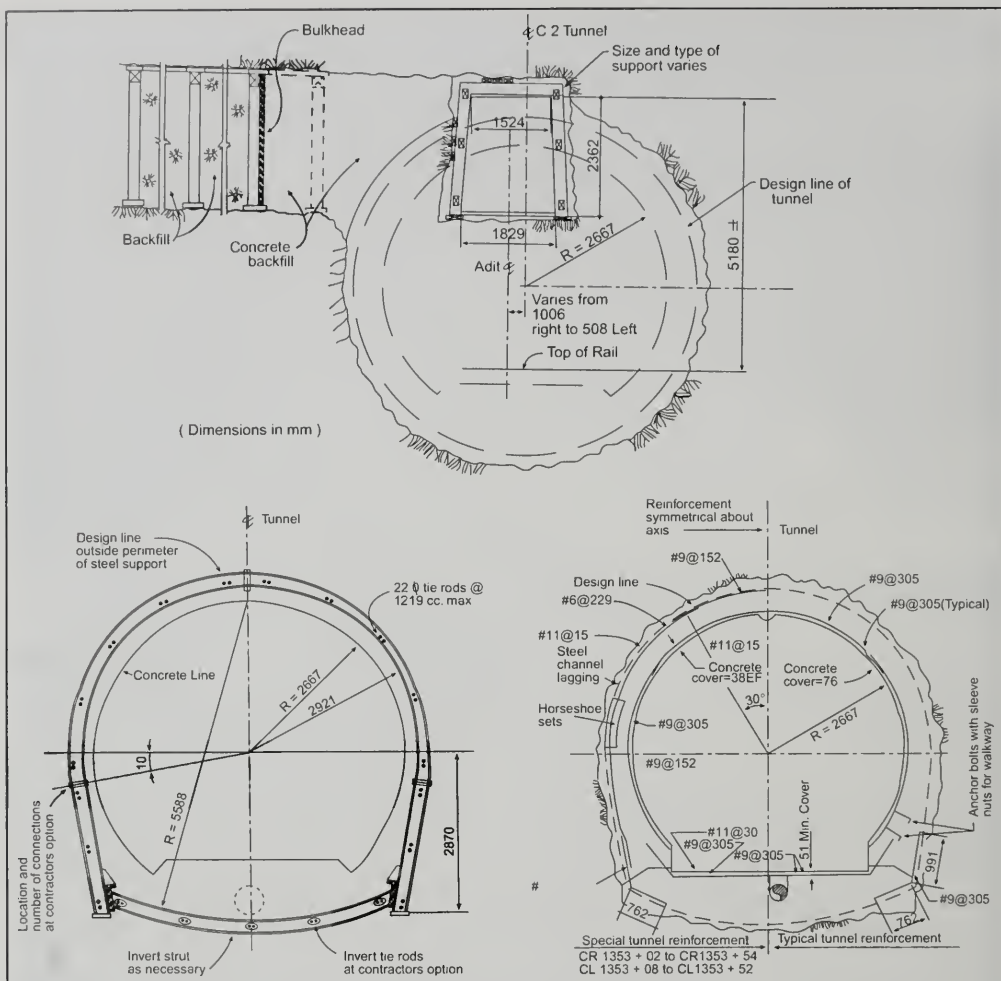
Comparative cross sections of the Berkeley Hills tunnels at various stages of construction, taken from Brown et al. (1981). The upper section shows the position of the exploratory adit excavated into the north tunnel, through the Hayward fault.
